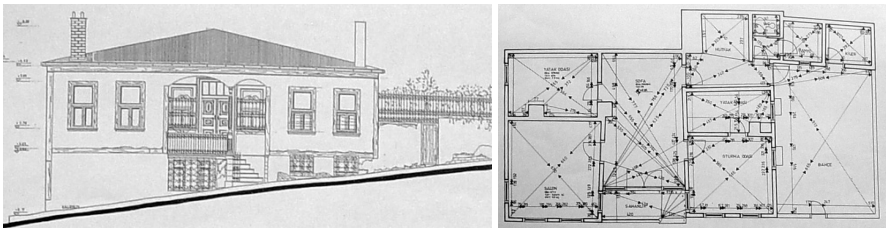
Sari Kosk Front Elevation and First Floor Plan
